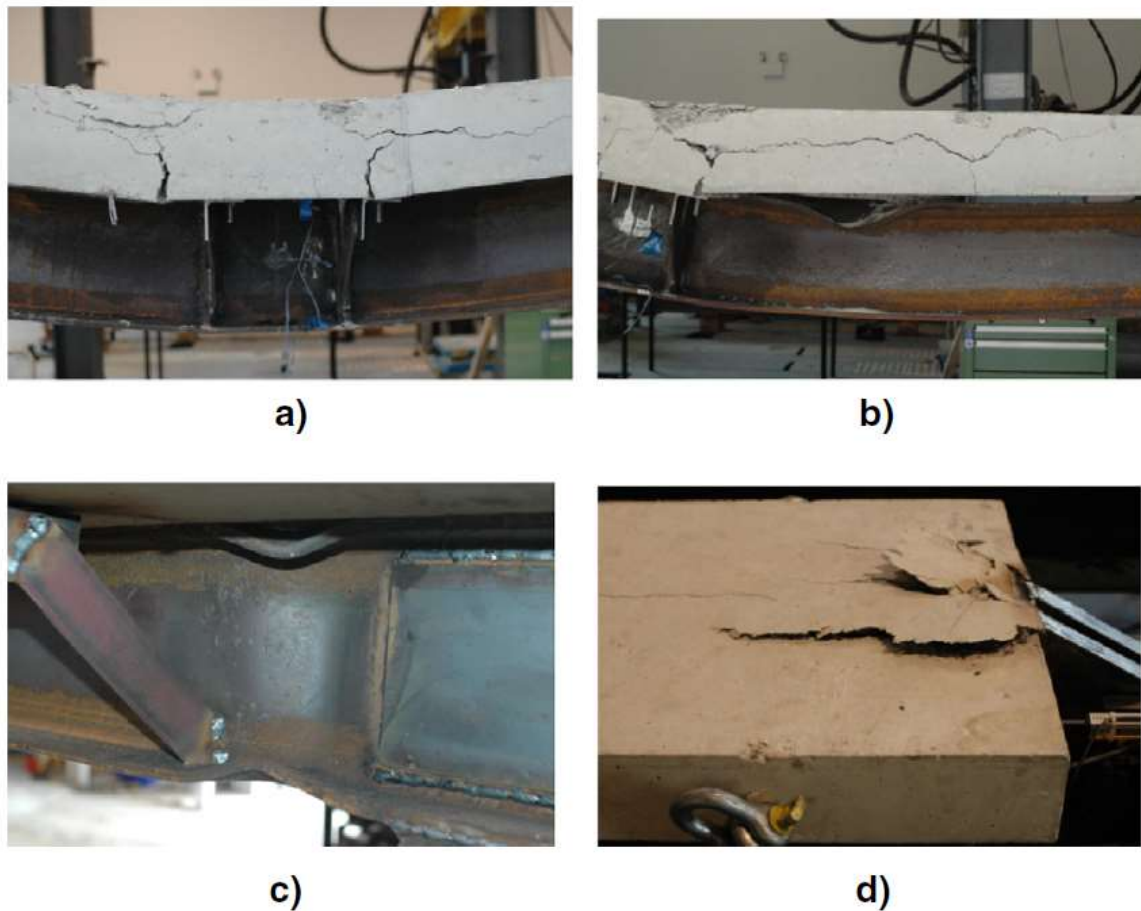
Failures in composite beams specimens: a) concrete crushing and cracking of the slab at midspan; b) shear connection failure; c) local buckling of the steel girder; d) concrete crushing at the zone of axial load application (Vasdravellis et al., 2015b)
